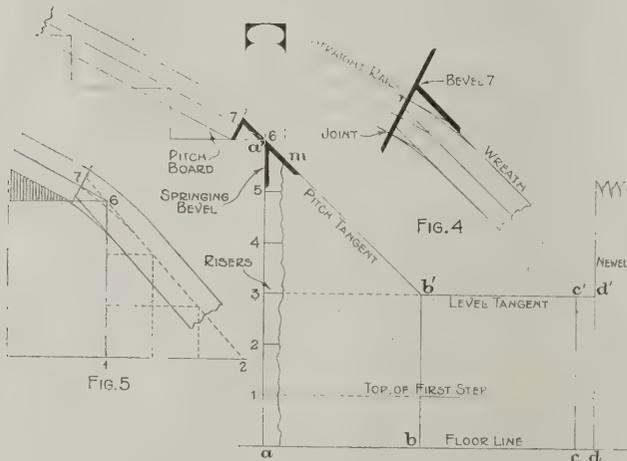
Elevation of Steps and Pitch of Tangents Over the Plan, Fig. 1
